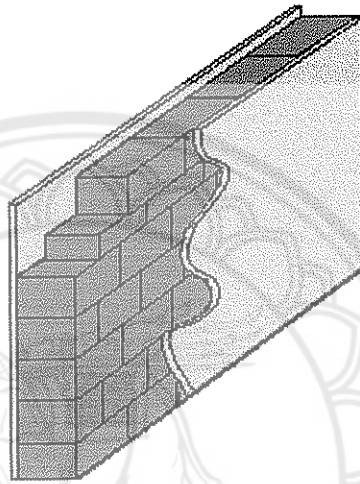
Section of brick with cement coated wall, thickness 0.10 m
